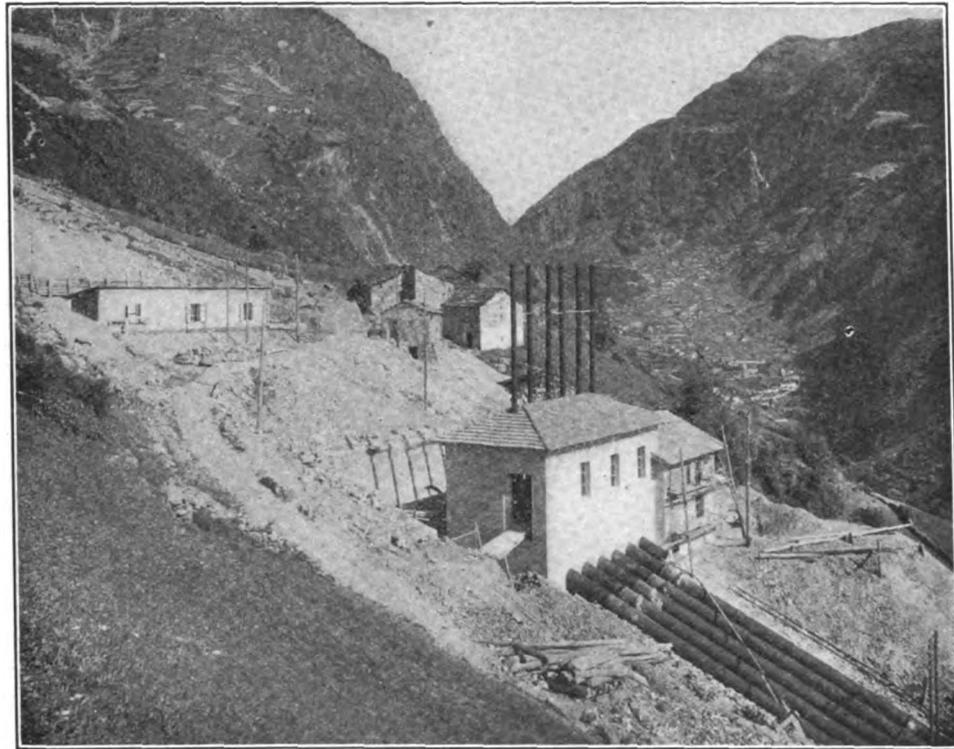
GATE-HOUSE FOR PENSTOCKS, HYDROELECTRIC PLANT, BRUSIO, SWITZERLAND.
